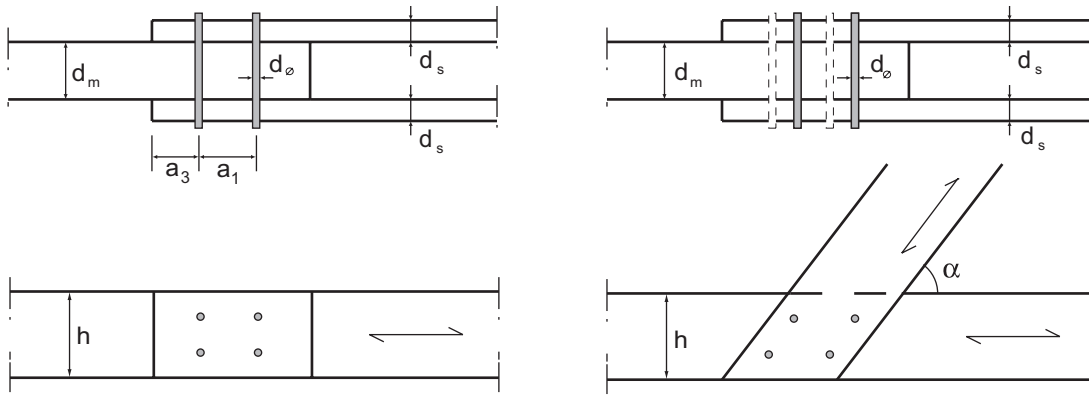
Tension or compression joint (left) and a typical truss joint (right), where the load is transferred under the angle α .
